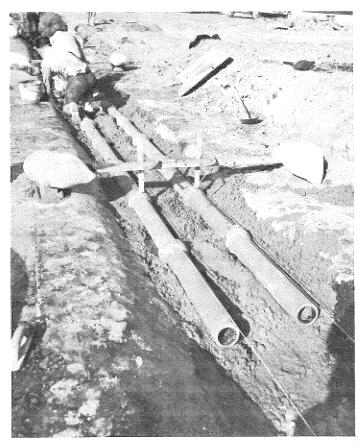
Installation of 4-inch tile drains in reservoir bottom.
